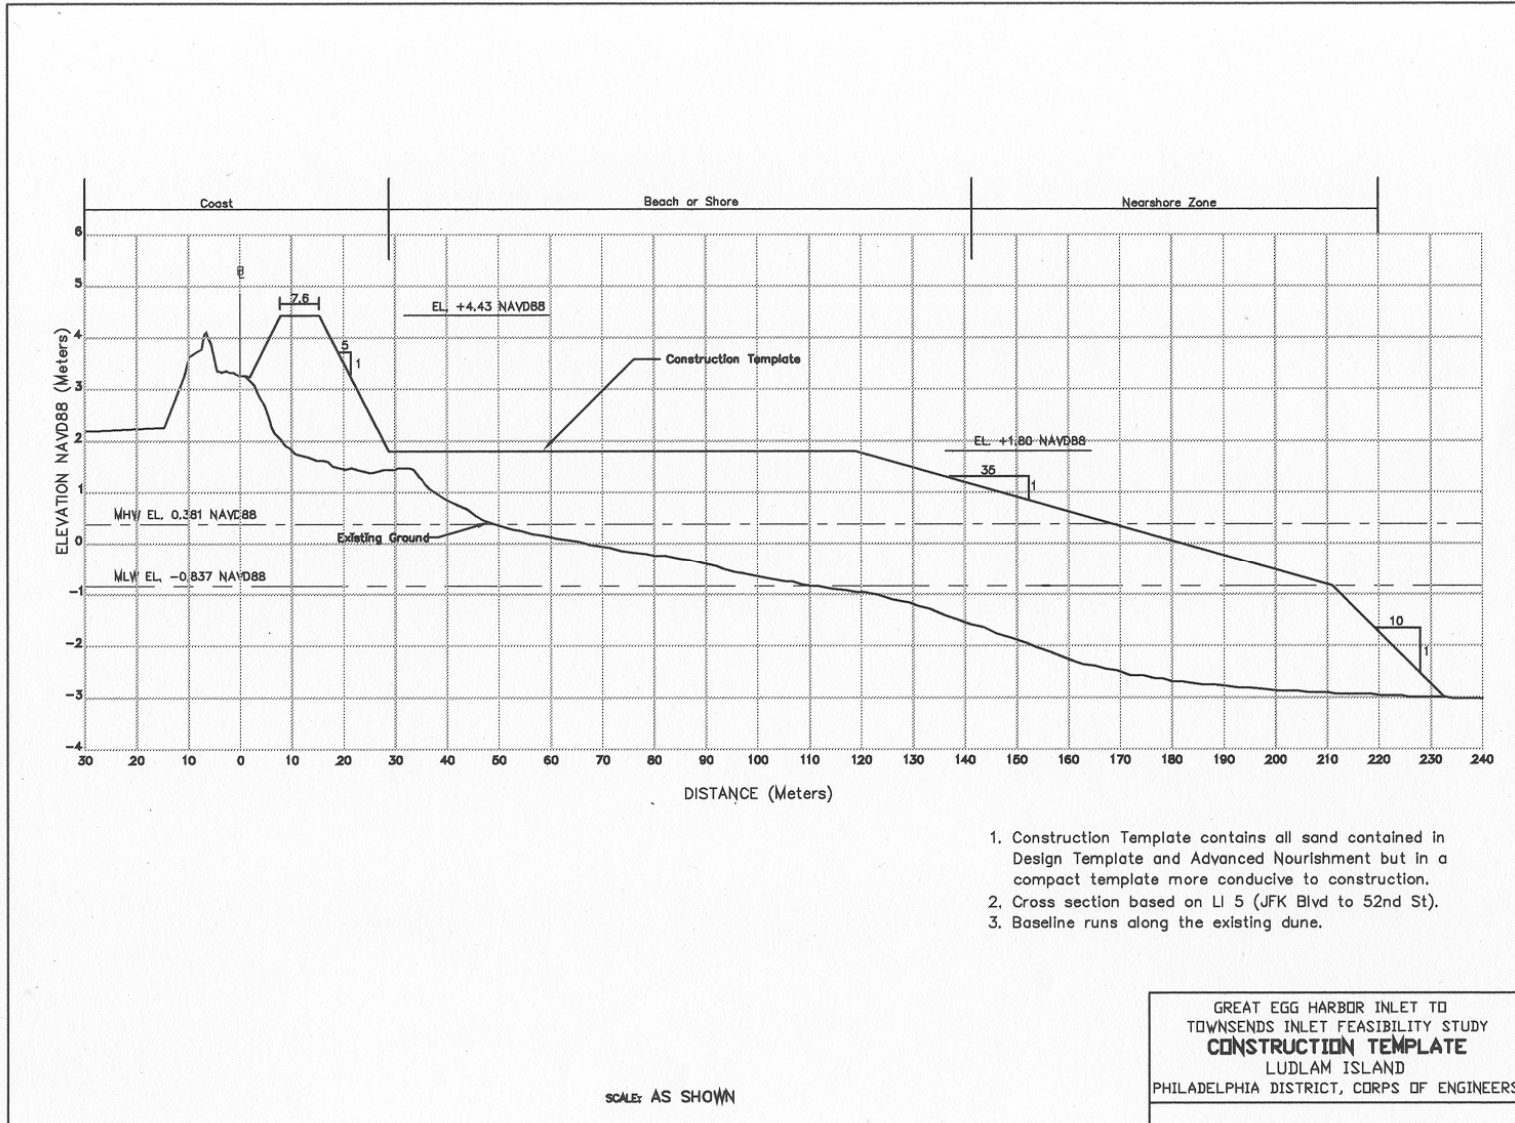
Selected Plan for Ludlam Island, NJ - Typical Construction Cross Section
